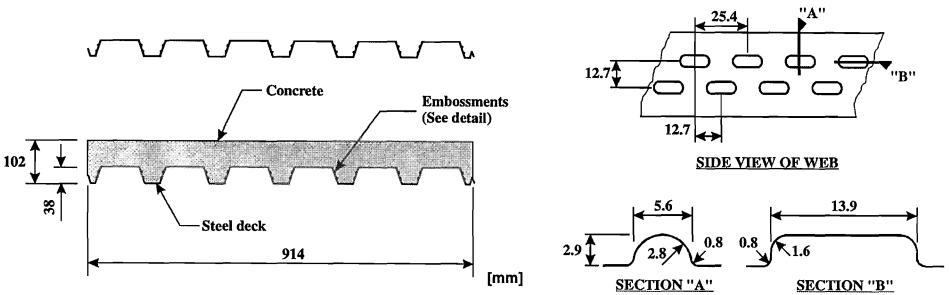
Typical Composite Deck Cross-Section (102 mm slab shown with deck in upright position)
